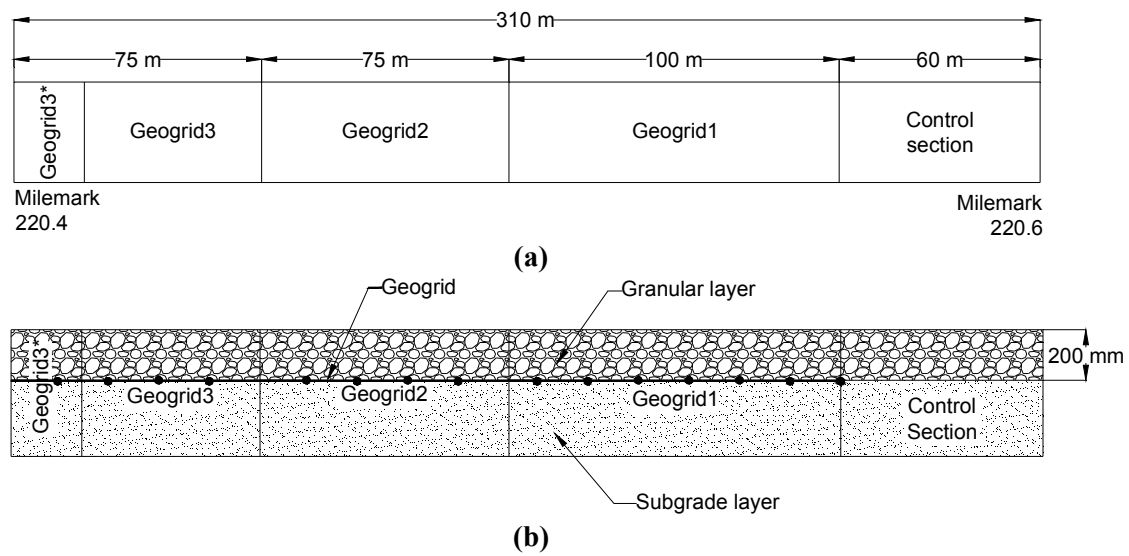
Schematic diagram of the test section (a) plan view (b) cross section
